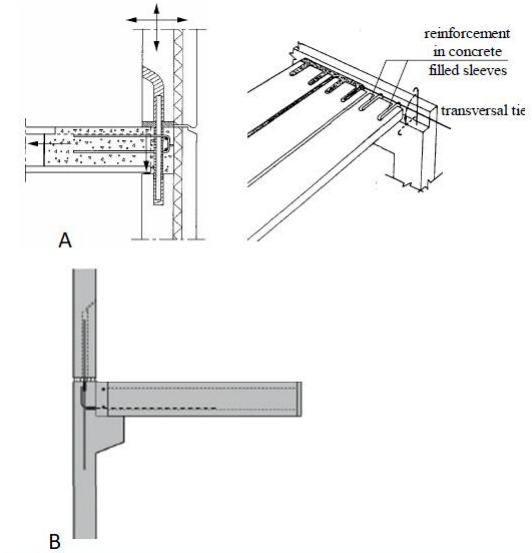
floor-wall connections a. floor integrated in the wall (FIB, 2008, p. 95 & 257) b. floor supported by corbel (TU Delft, 2016, p. 10.10)
